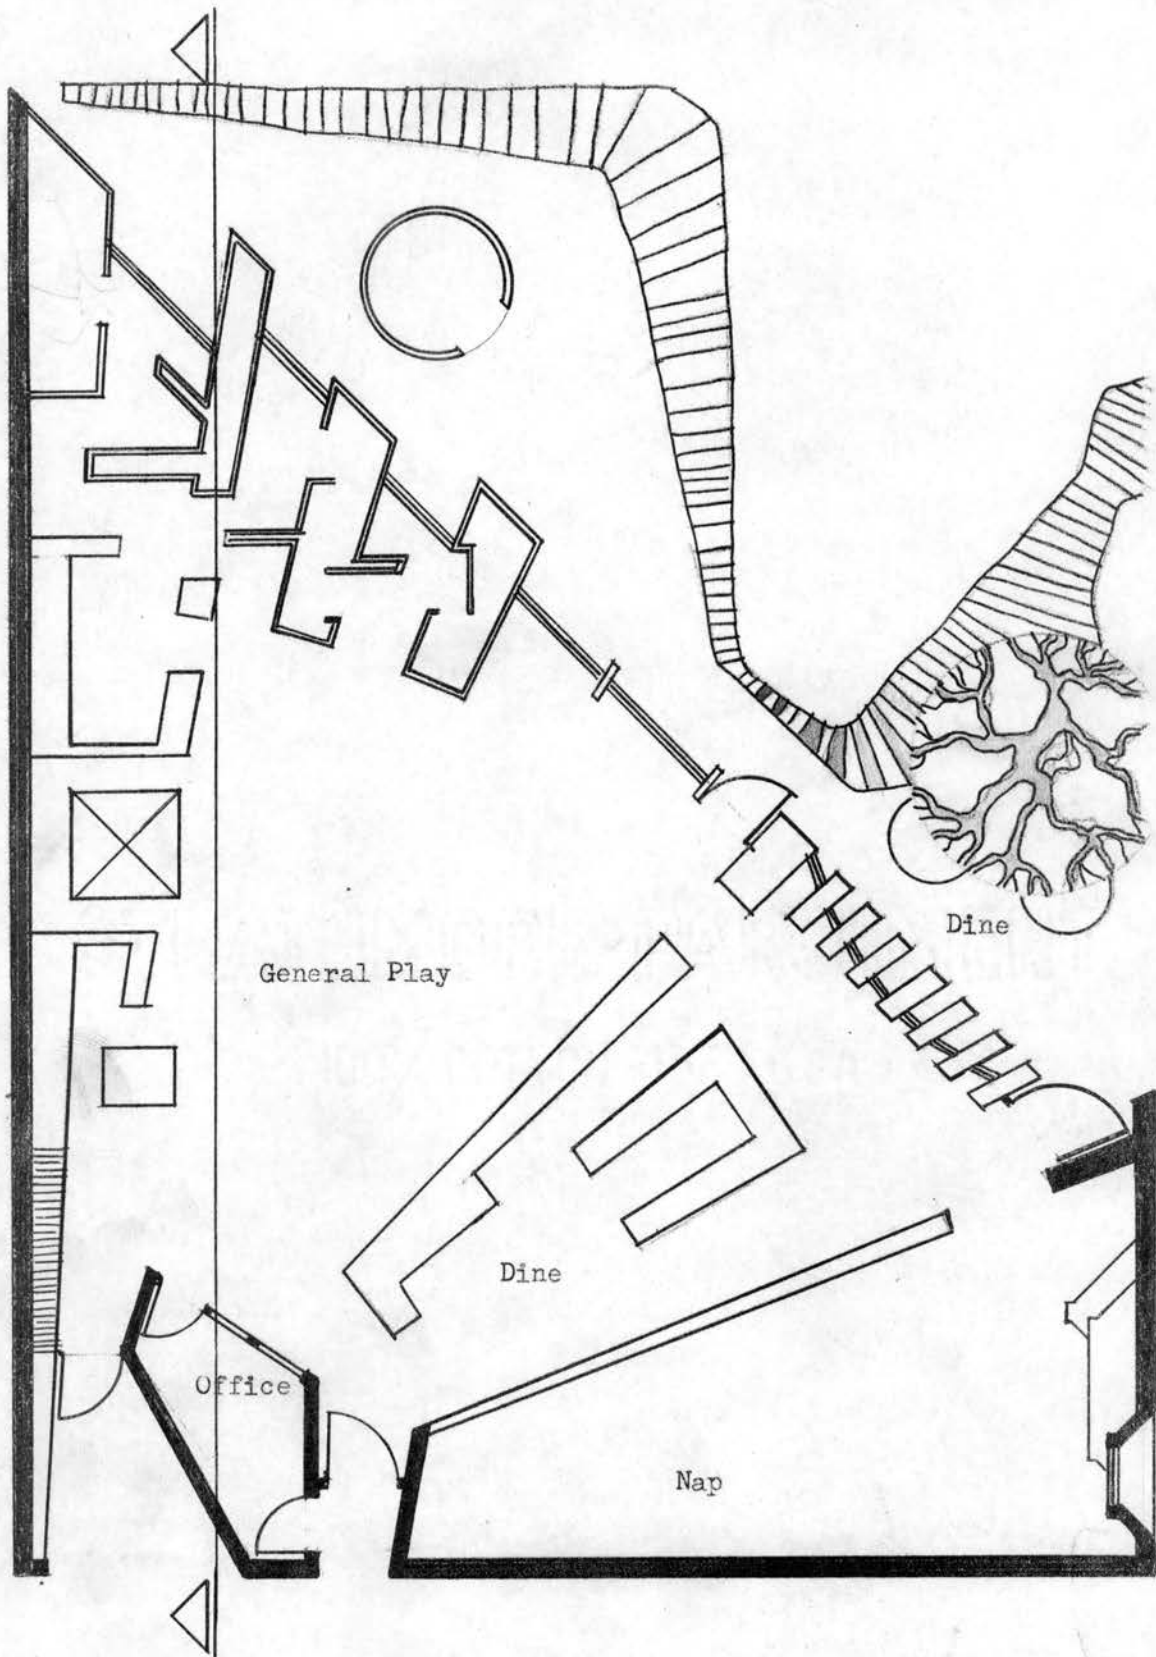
Plan of Typical Group Area - Scale $\frac{1}{8}''/1'-0''$
